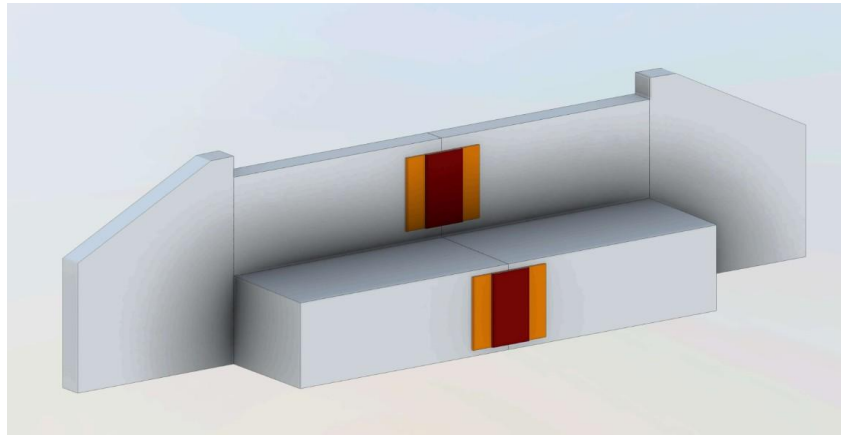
Rendered view of the precast concrete abutment showing the two-piece split arrangement, centreline joint, bearing seats, and ballast wall.
